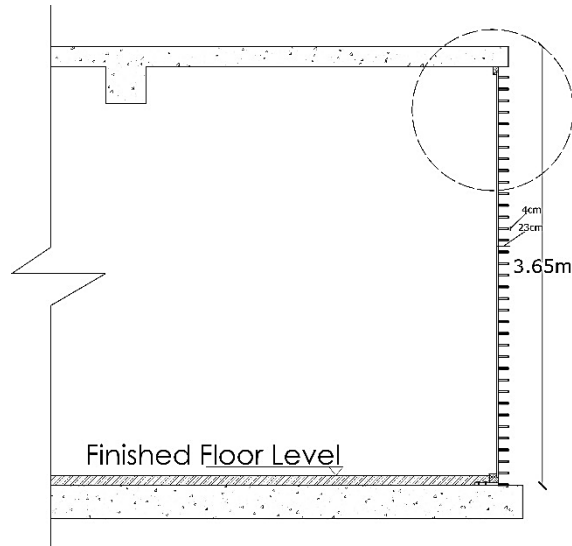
Full height section of the western façade of the existing office floor with horizontal aluminium slats attached.
